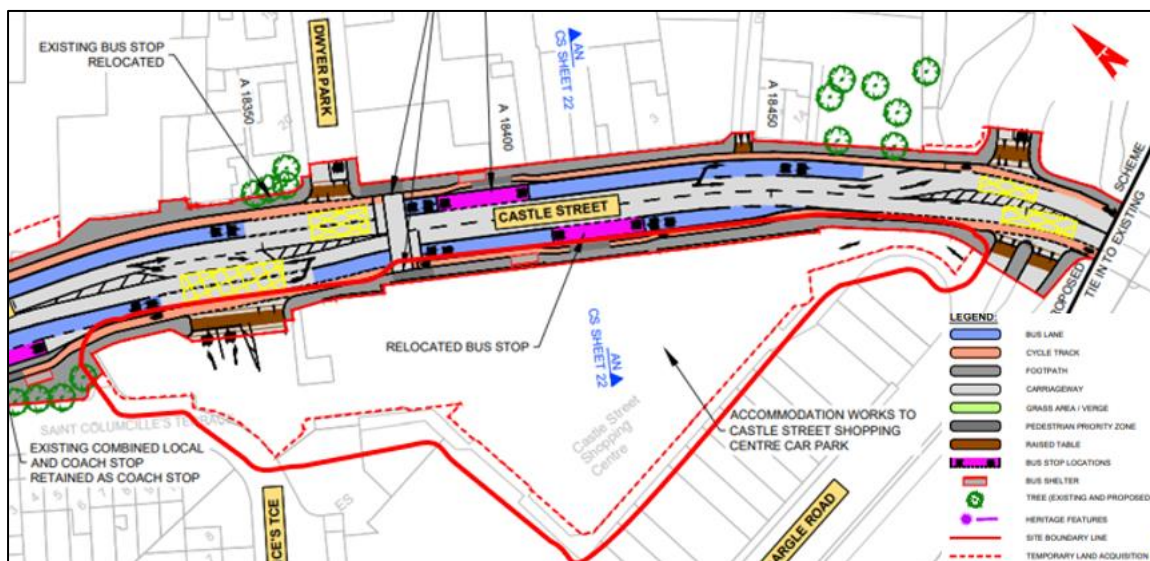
Extract from General Arrangement Drawing at Castle Street (Sheet 52)
